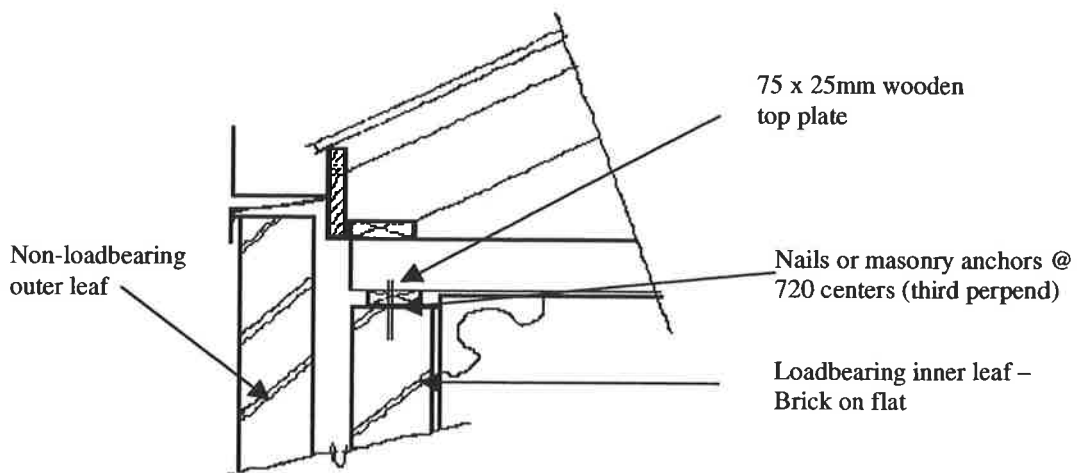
URM Cavity Wall to Roof Truss Connection Detail (Inner Loadbearing)
